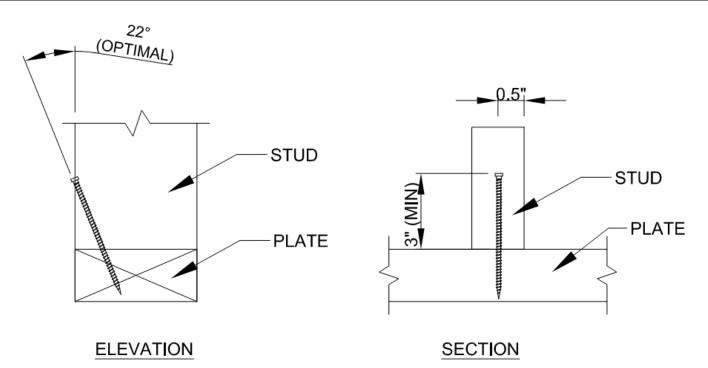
Elevation and Section Views for Fastener Installed in Narrow Face of Stud
